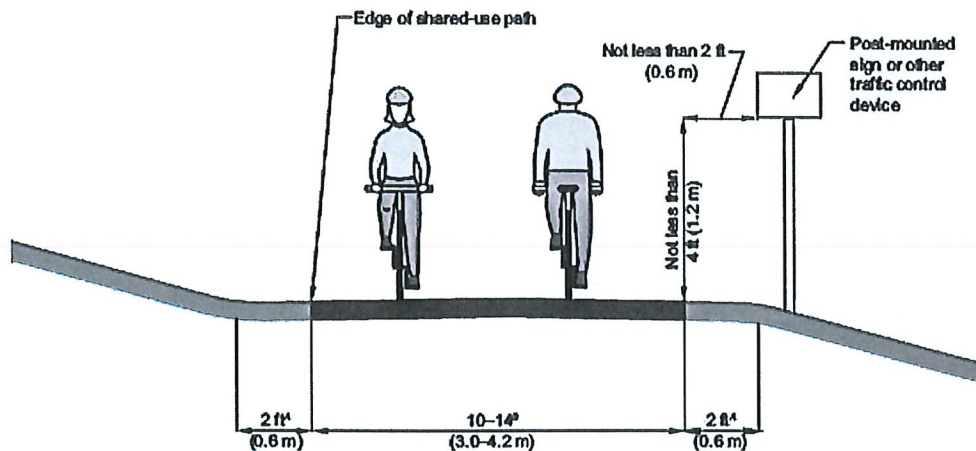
Typical Cross Section of Two Way, Shared Use Path (AASHTO)
